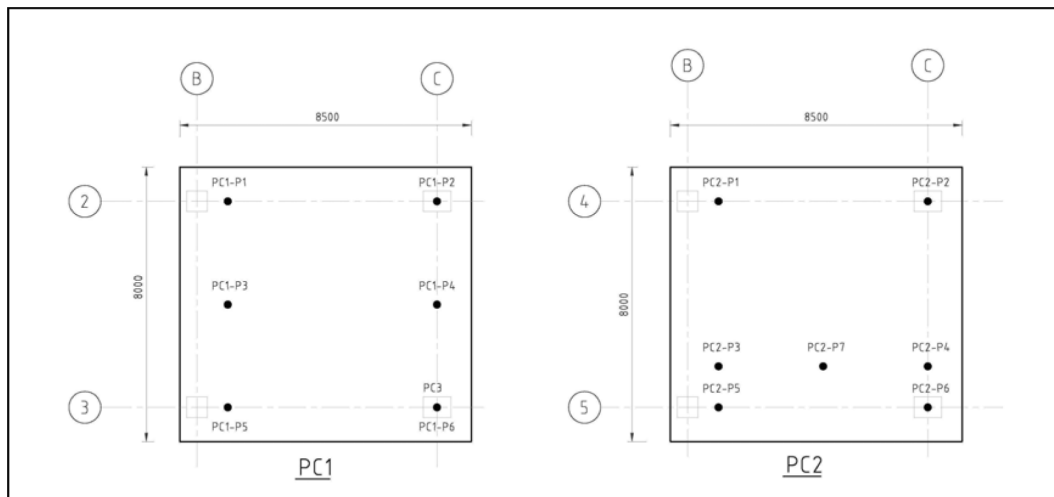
Piling Layout of Pile Caps PC1 and PC2
